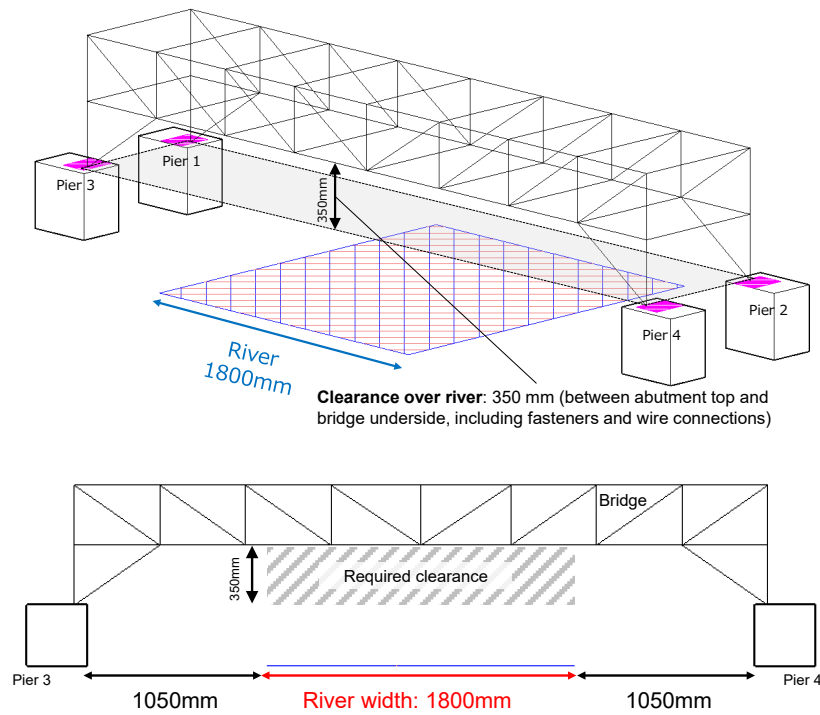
Pier dimensions for the erection competition and designated contact areas for the bridge. The bridge must be touched to the pink area of the pier after the construction. Bridge member must not touch the pier except the pink area
